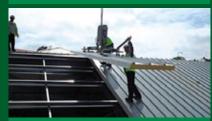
TYPICAL COMMERCIAL ROOF DESIGN AND LAYOUT.
